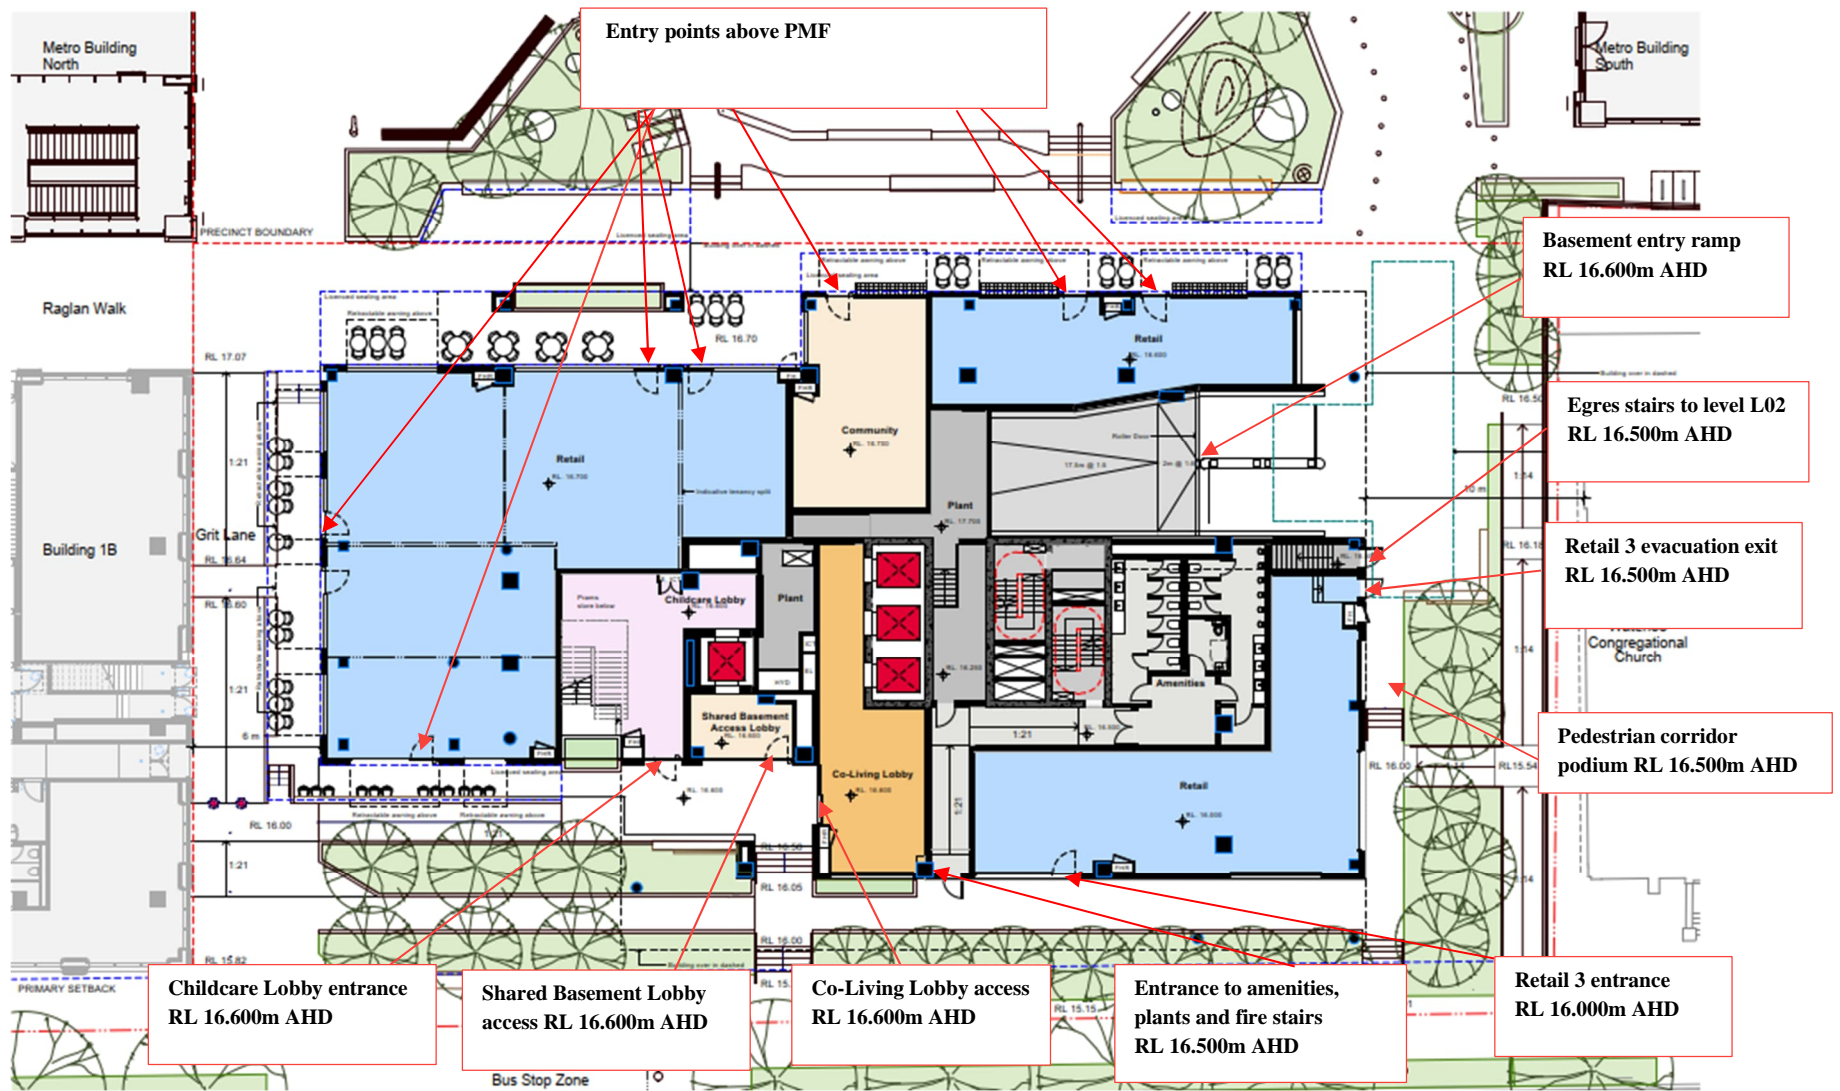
Central Precinct ground floor plan with main access/exits point
